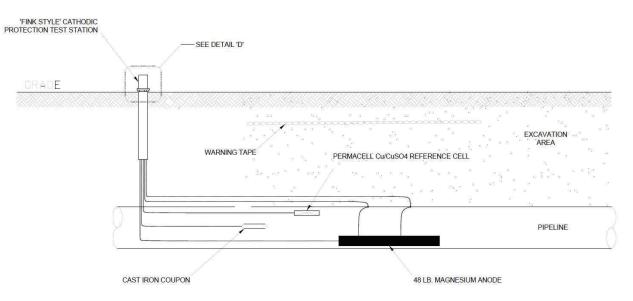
Sacrificial anode and monitoring systems Layout - Elevation View
